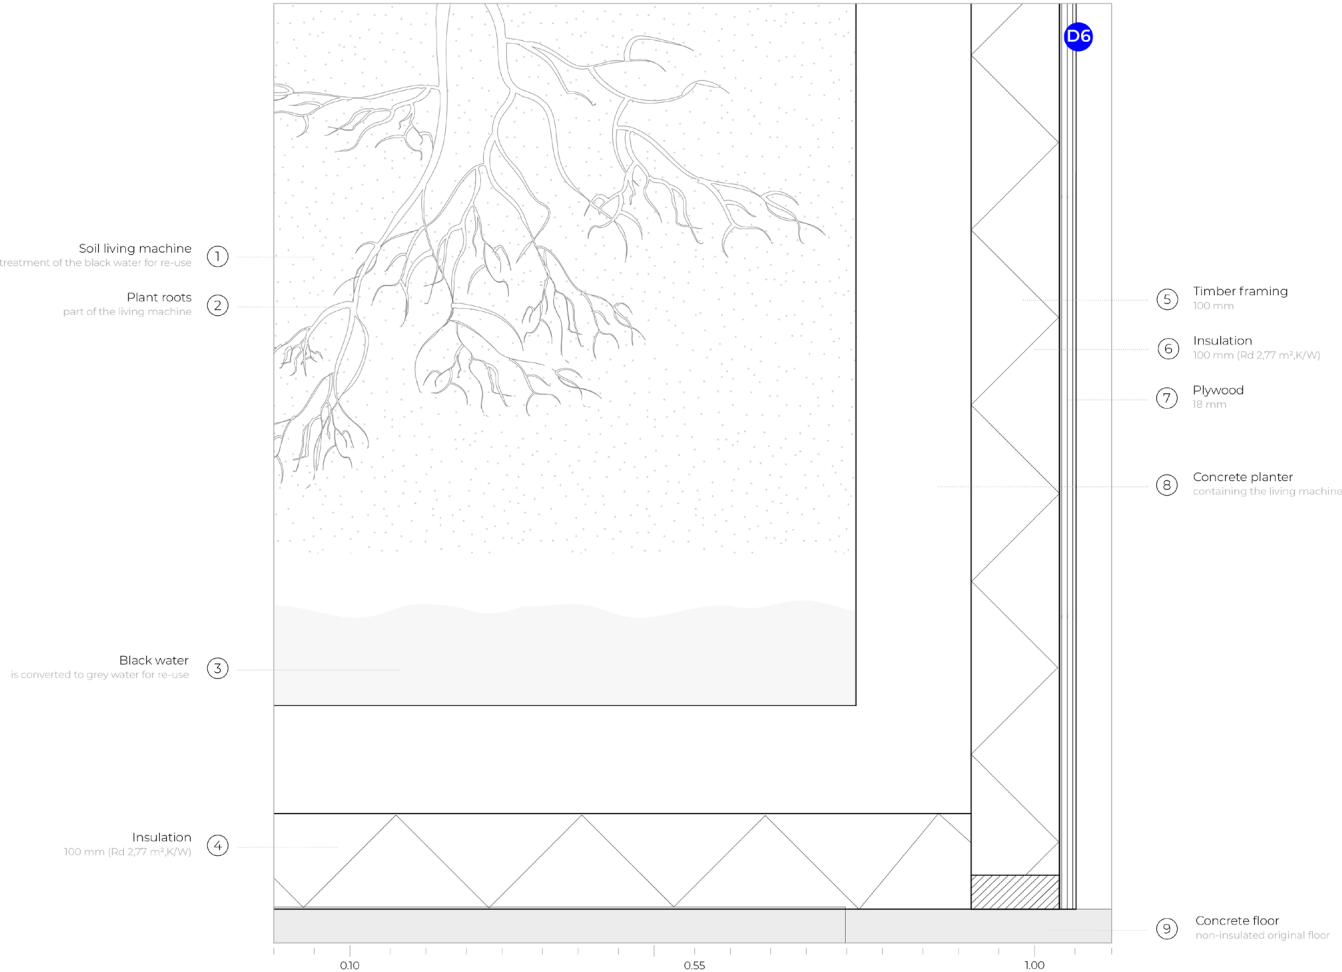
DETAIL DRAWINGS | VERTICAL SECTION D | SCALE 1:10
